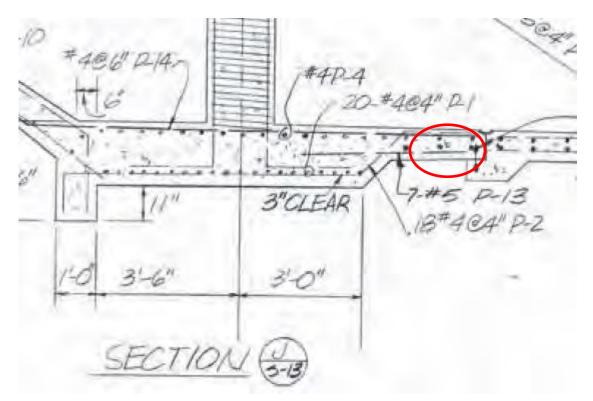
Unreinforced Expansion Joint, Drawing 10-S-14 from 1971 Drawings
